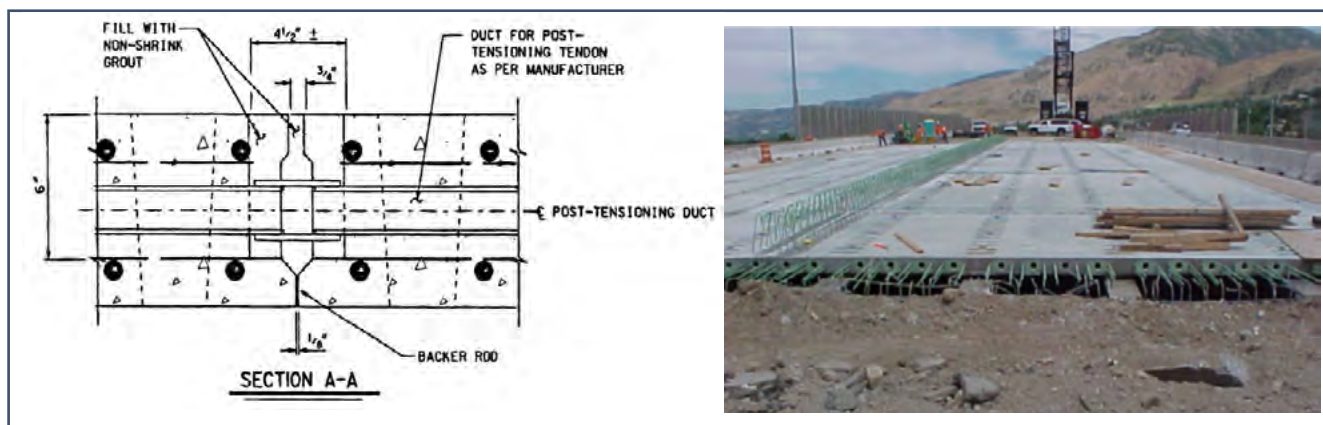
Grouted shear key detail for transverse joints of full-depth precast deck panels from Utah DOT
